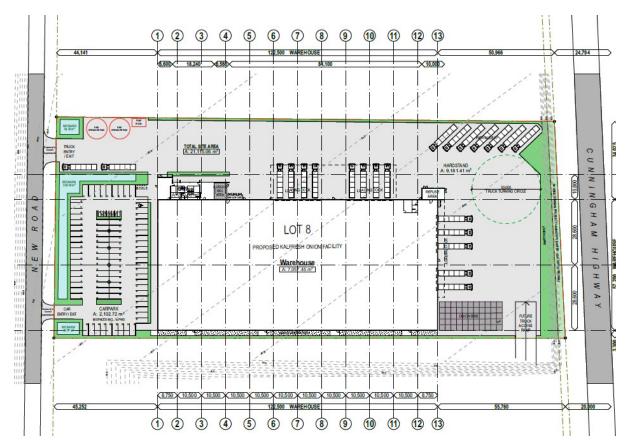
Site Plan of Proposed Onion Production and Storage Facility
